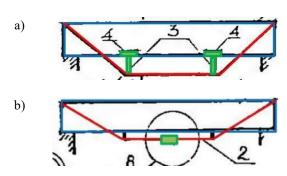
Typical constructive decisions of reinforced concrete constructions external strengthening by steel rods (springs) with a tension of the last by:
